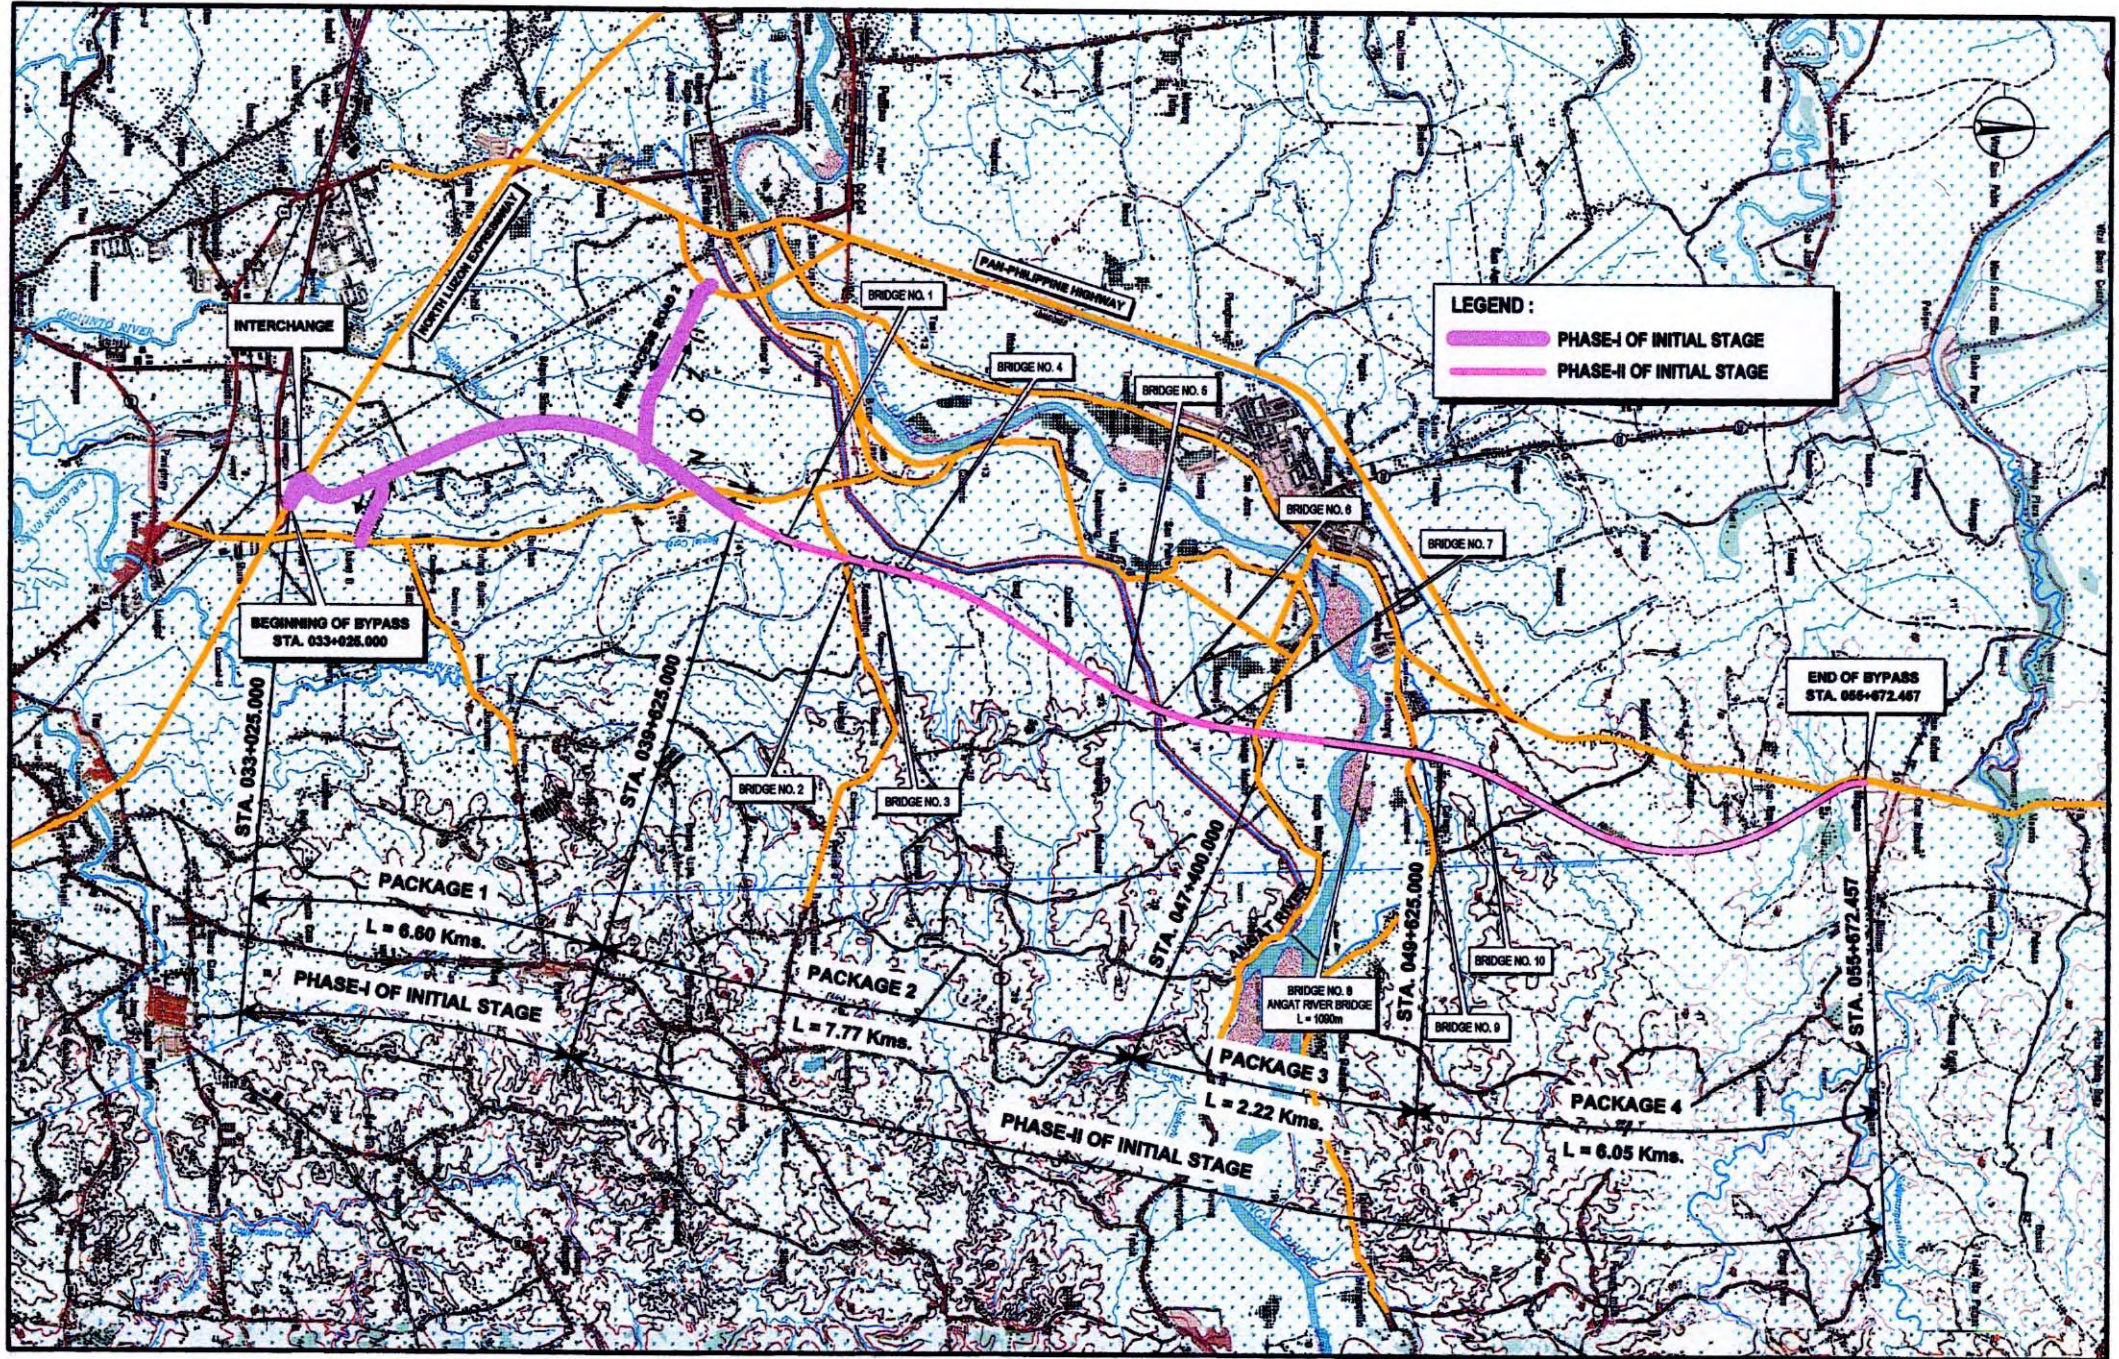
CONSTRUCTION PHASING OF PLARIDEL BYPASS
